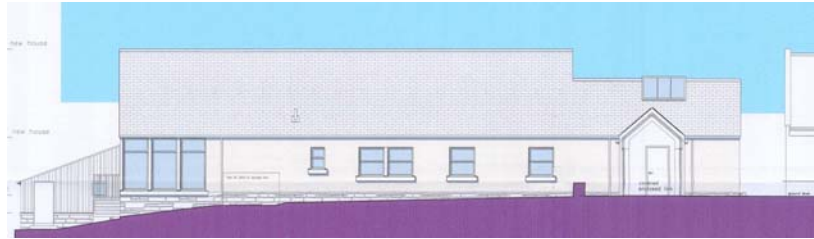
View from south (section shown through linking corridor to main dwelling house).
